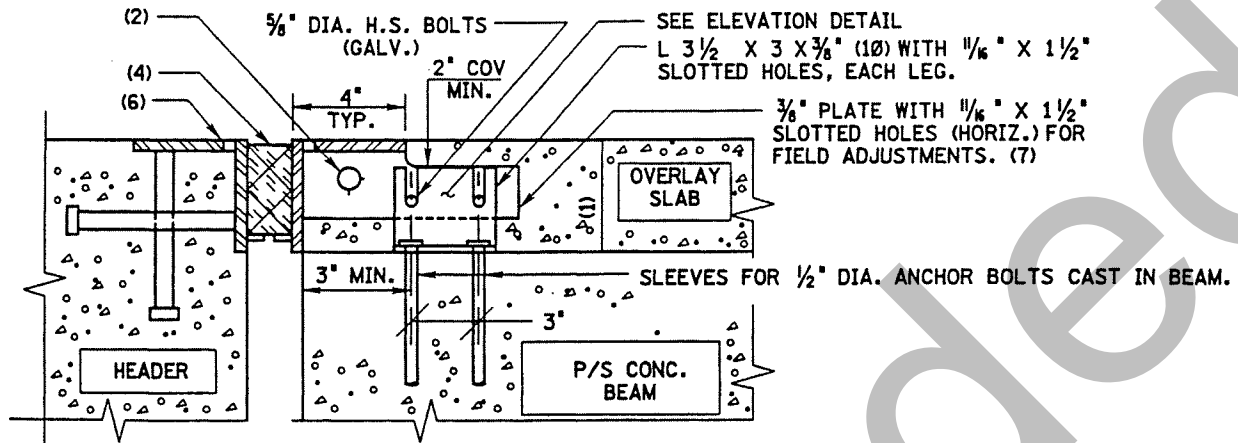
DETAIL "B" (ALSO SEE GUIDE SHEET PLATE 3.8-11)
